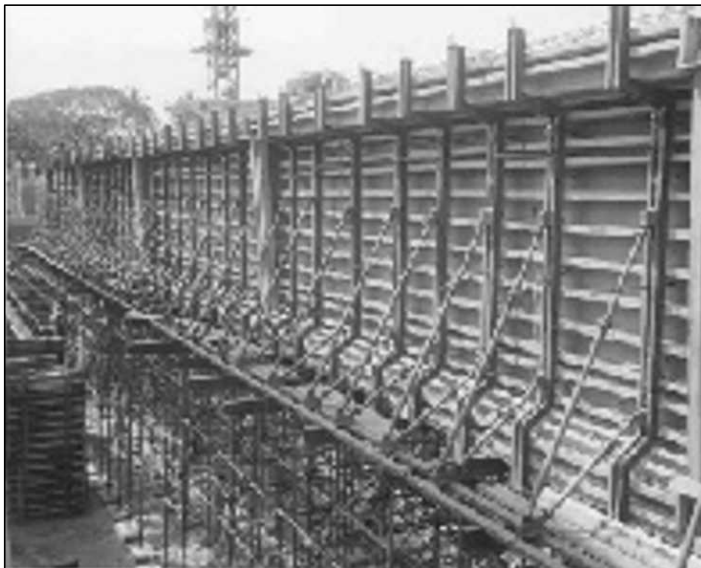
Formwork Arrangement of *Cast-in-situ* Girder Using L&T Formwork.
